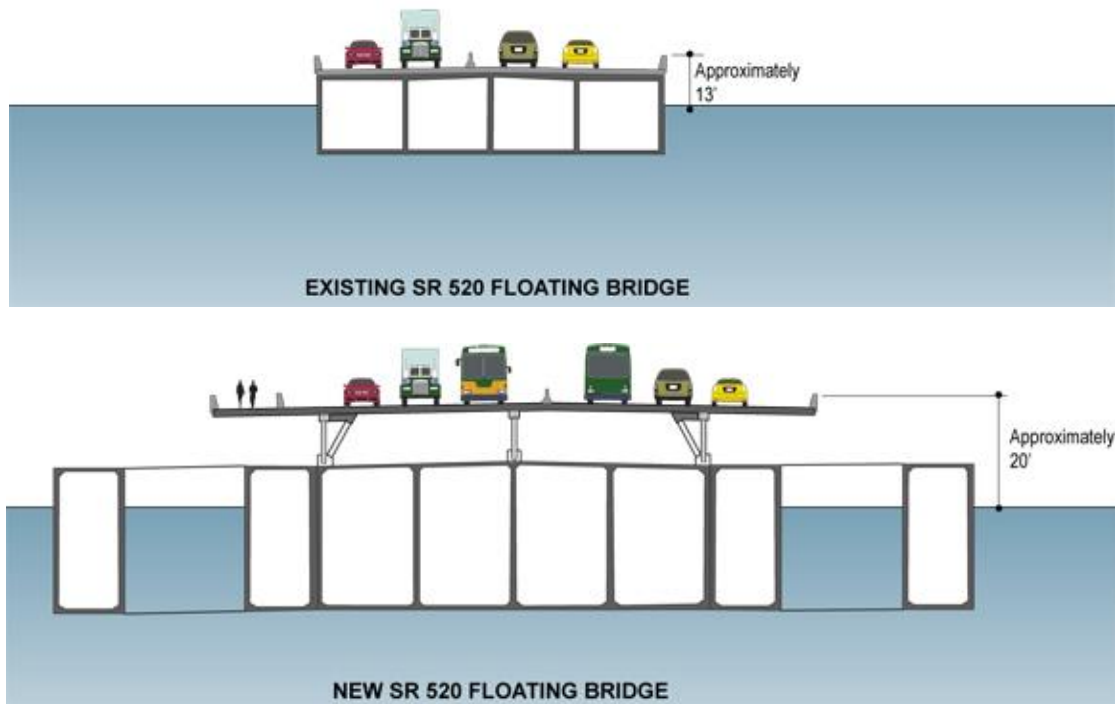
The SR 520 Floating Bridge’s existing and new section view
